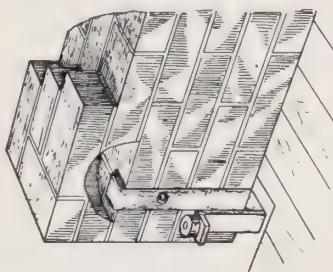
Bottom U-Shape Roller Guide and Bolt.
